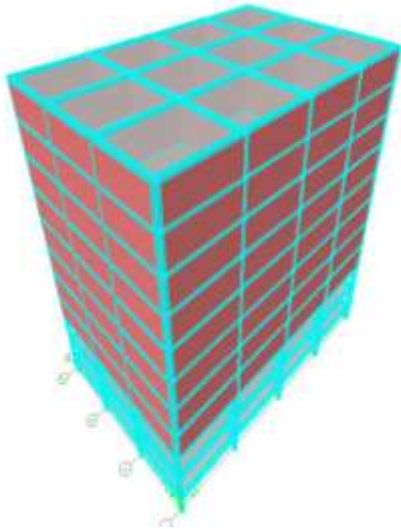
Model 6: G+10 RC three soft storey building with slab element 3D view
